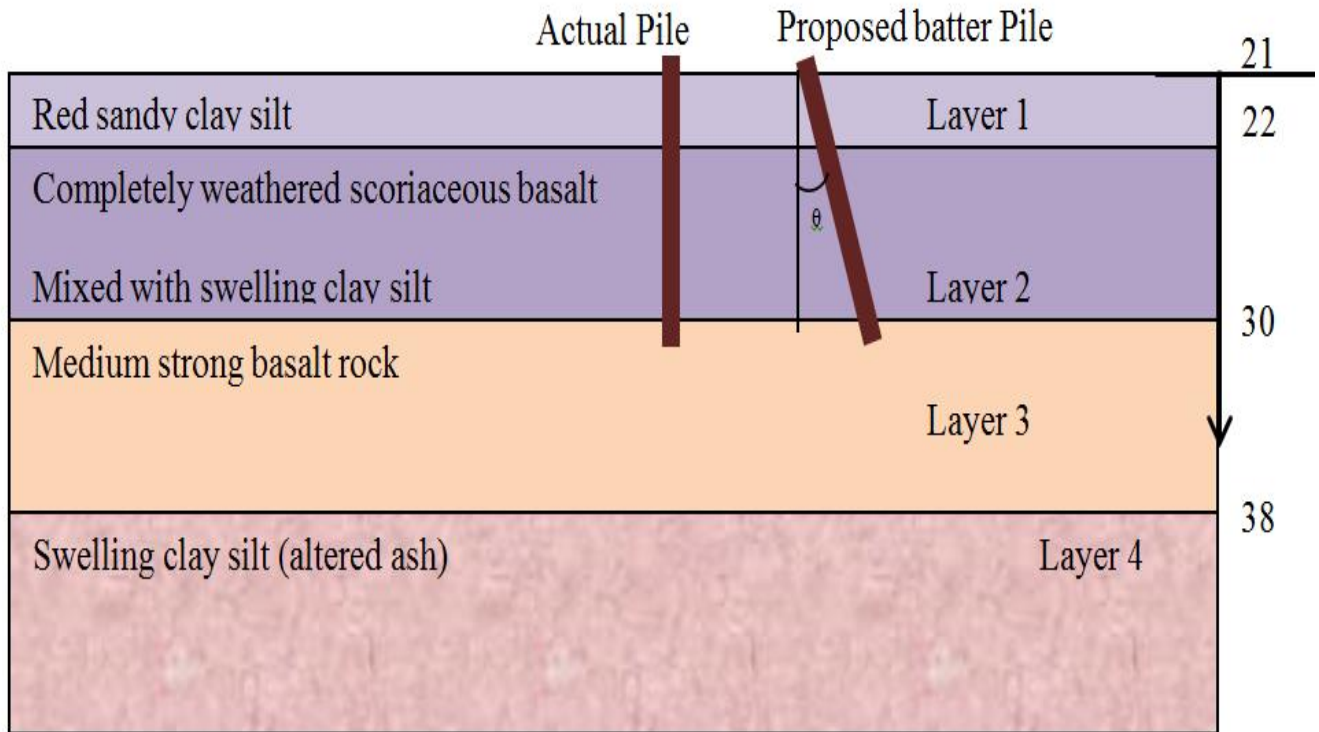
Pile and foundation profile of Commercial Bank of Ethiopia
